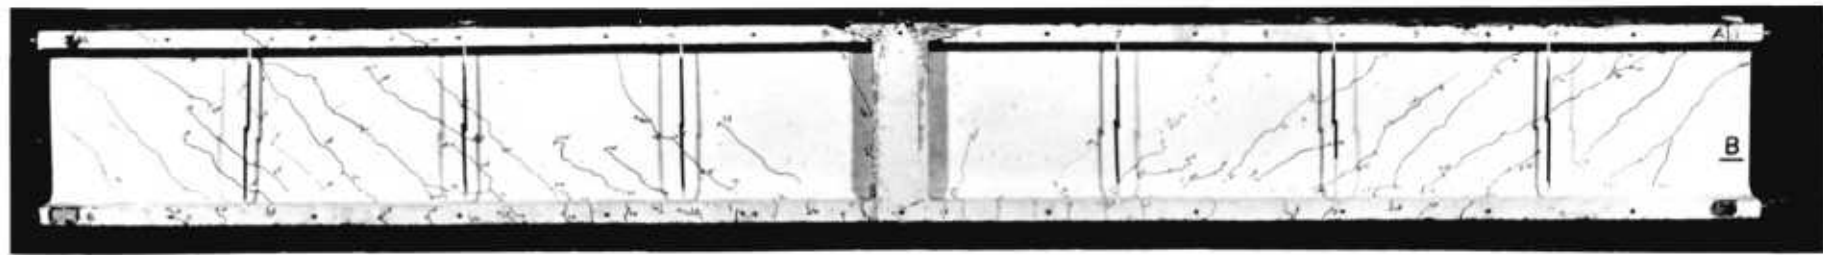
Crack Development on I-Section with Single Stirrup Reinforcement
